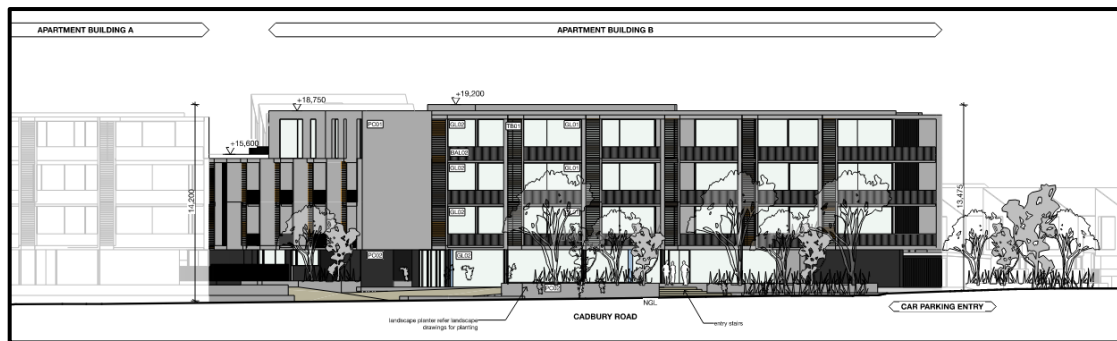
The western elevation view of building B looking toward the proposed building from Cadbury Road.
